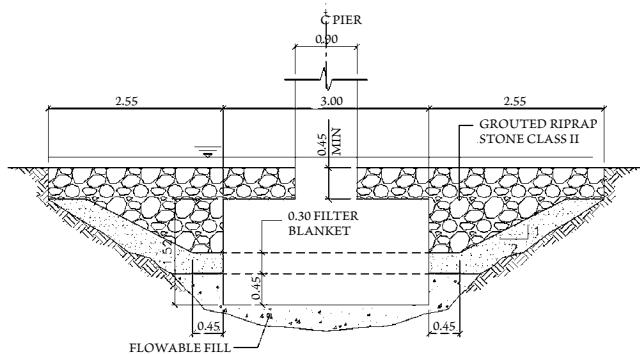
Typical section for scour and exposed footing repair with flowable fill and grouted riprap.
